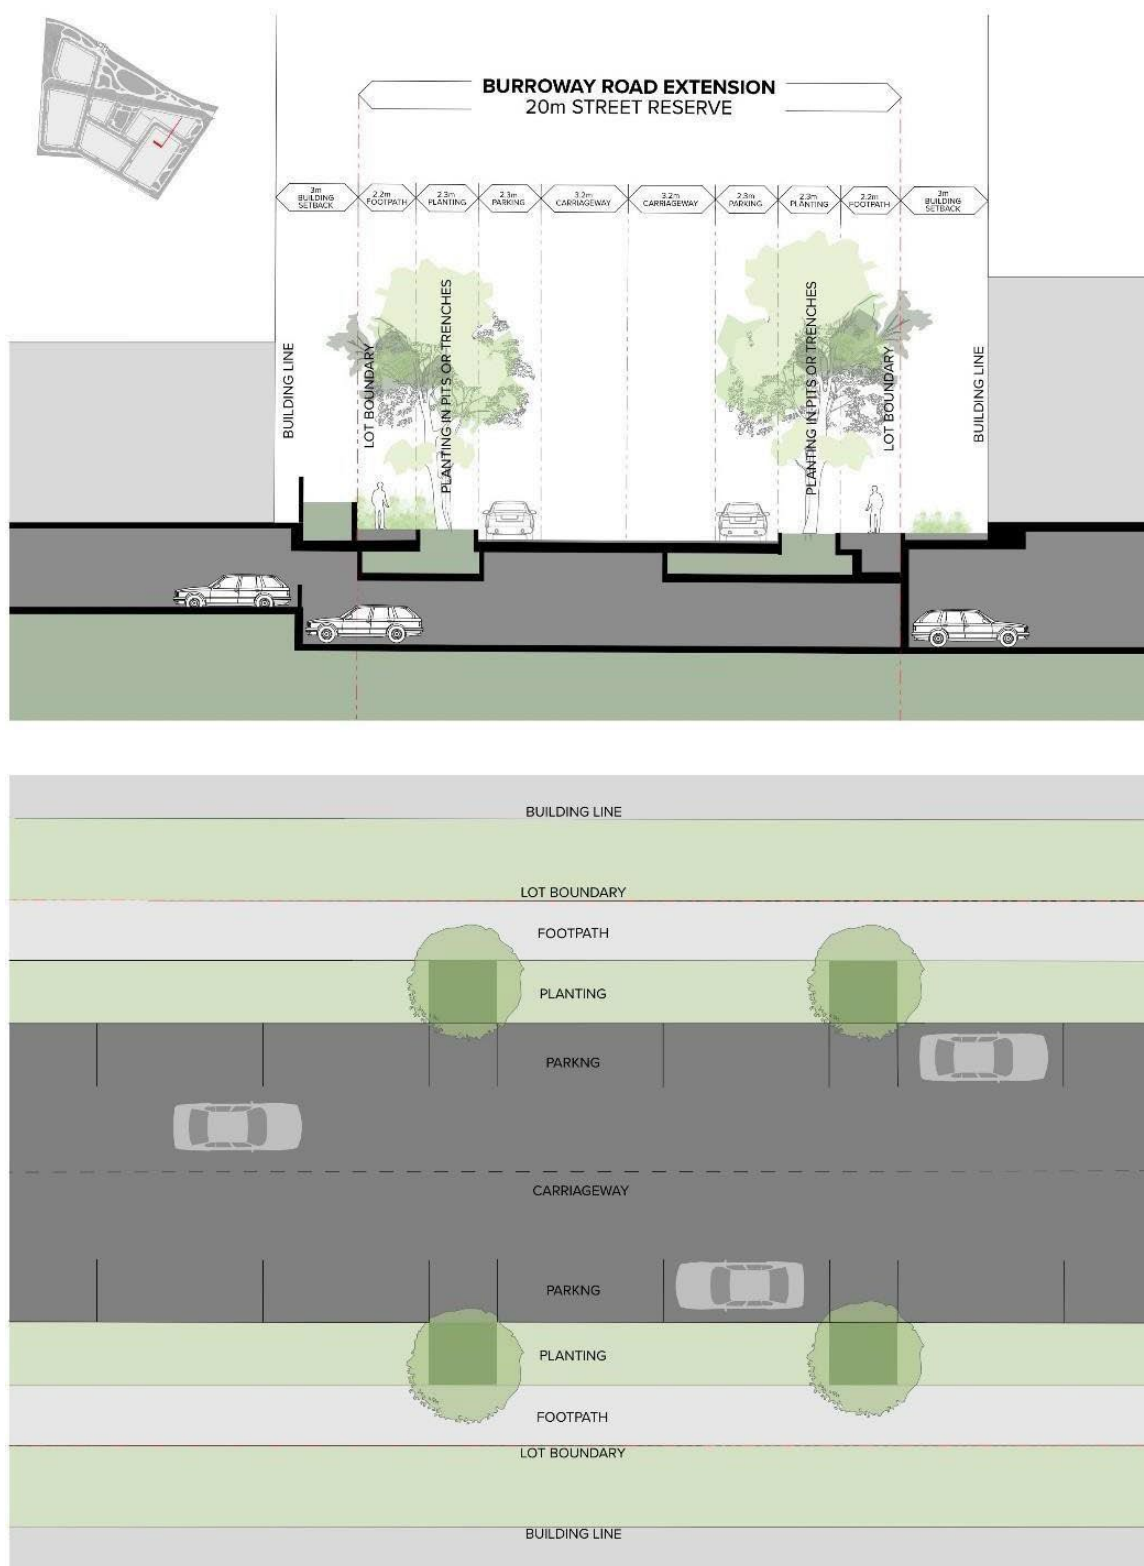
Burroway Road (western extension) Indicative Cross-section
